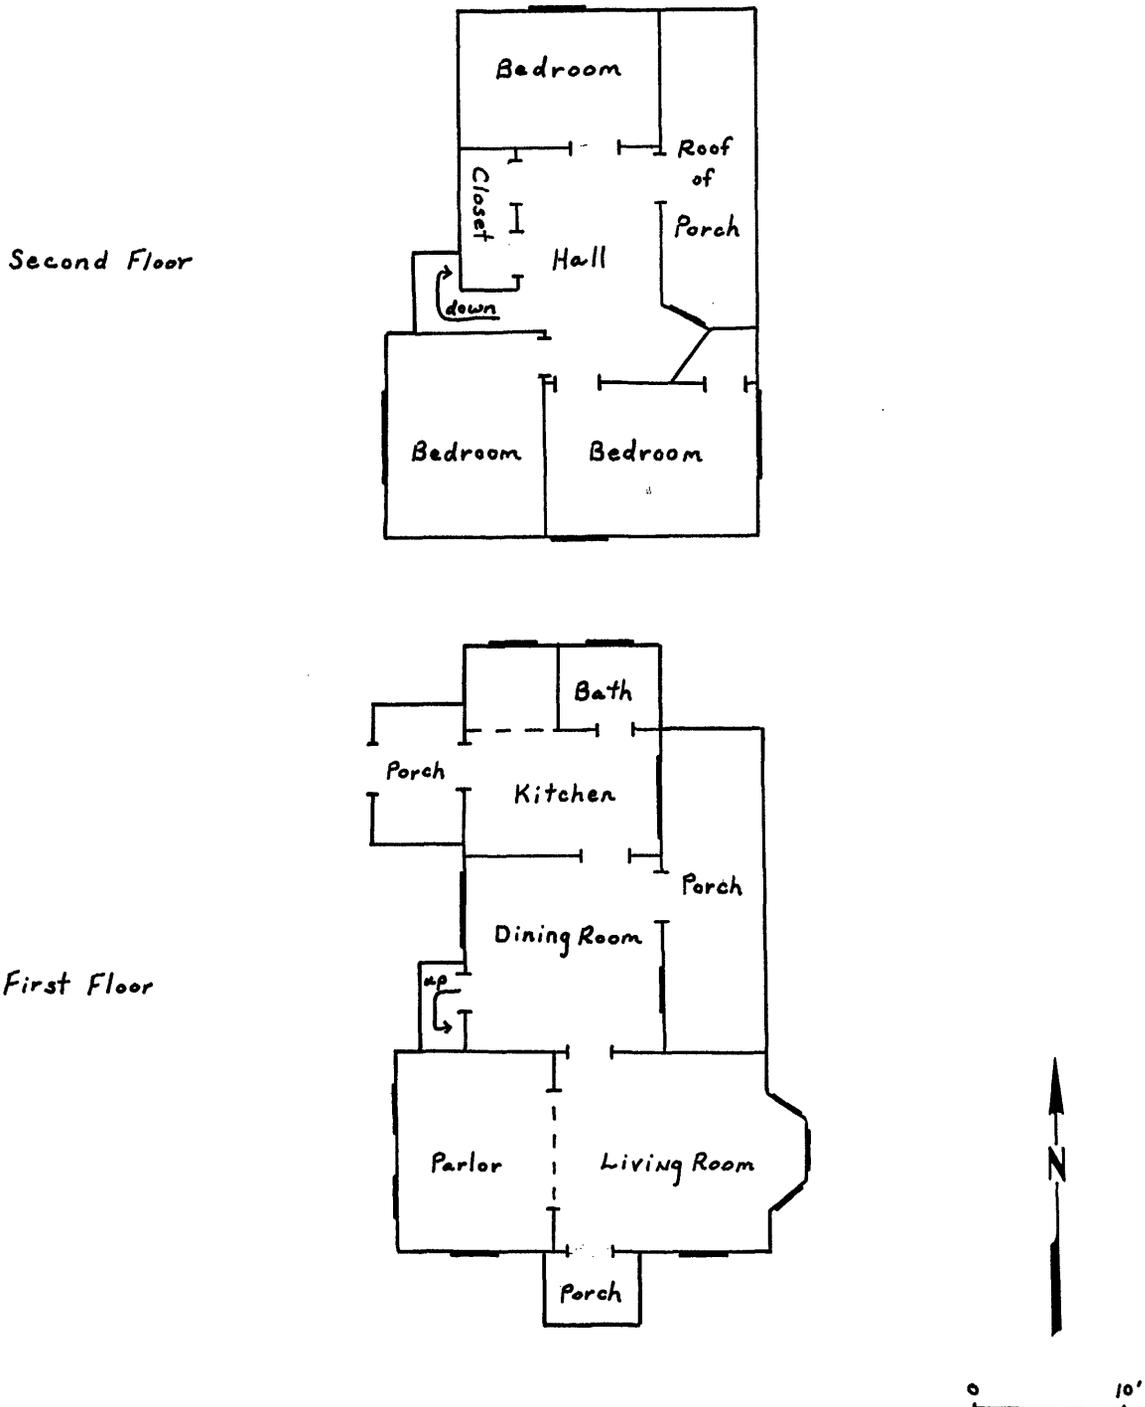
Floor Plan of Jens T. Larsen House, Kimballton, Gabled Ell House Type.
